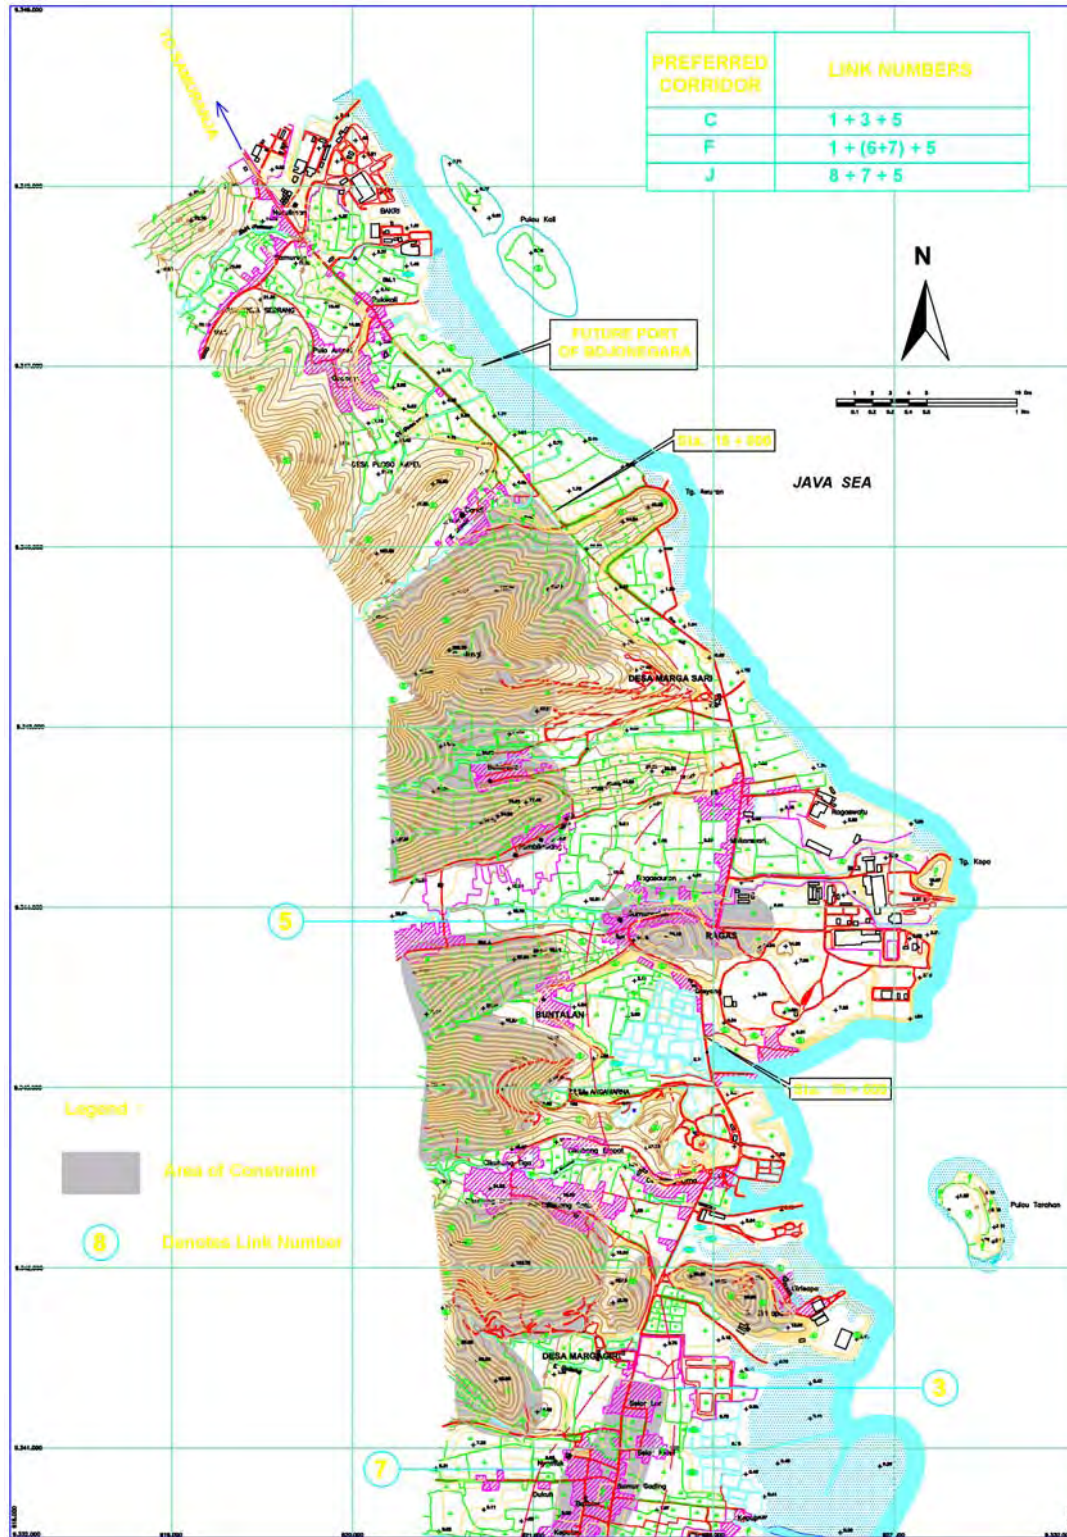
Bojonegara Port Access Road Plan (2/2)
